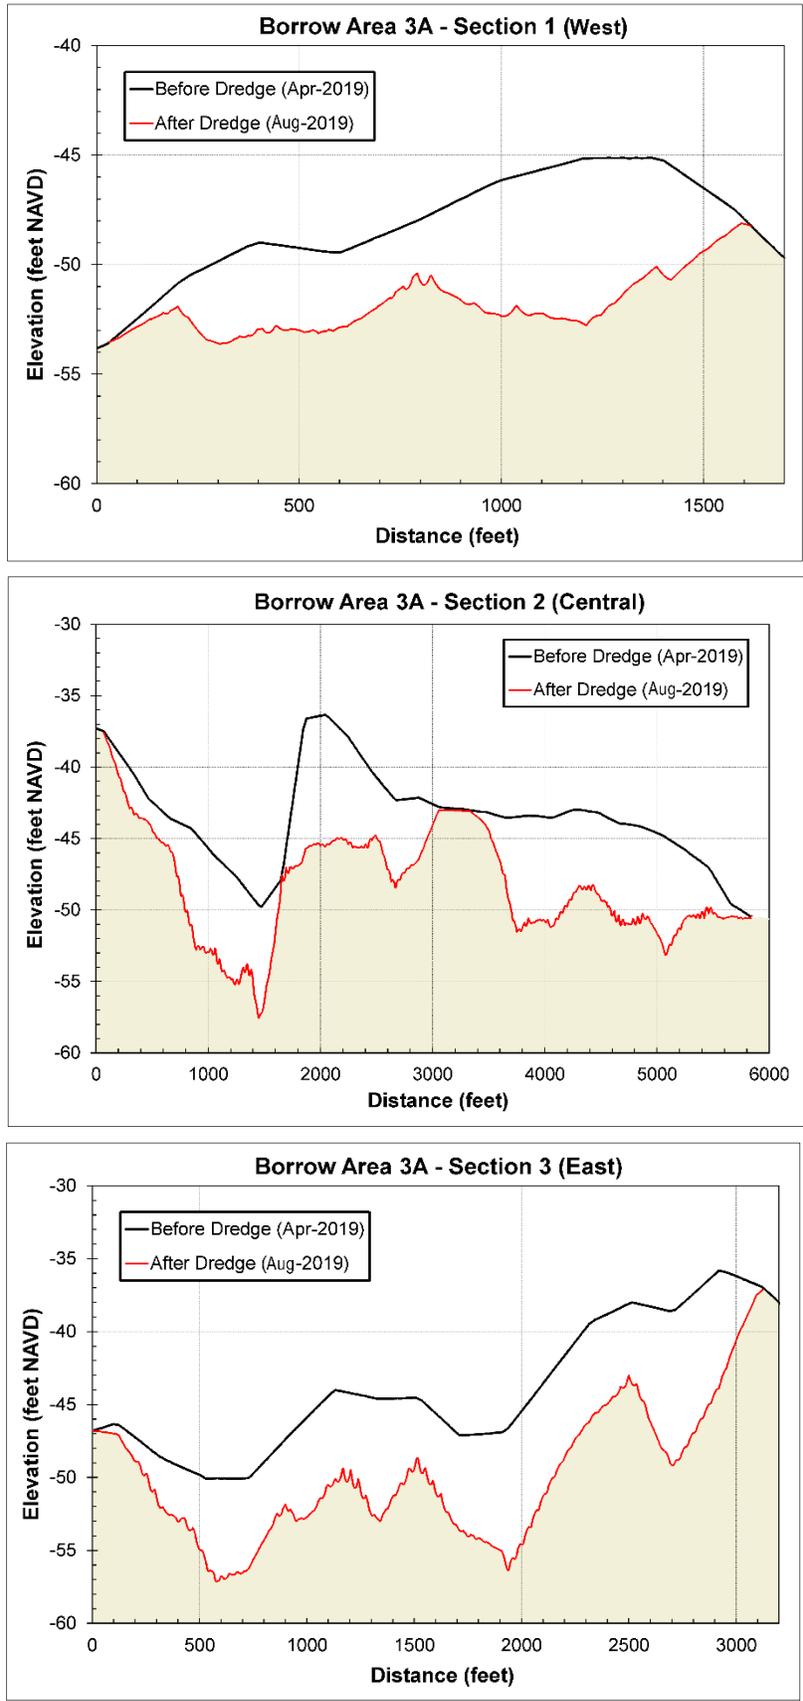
Representative cross-sections through Borrow Area 3A highlighting excavation during construction. Locations of these cross-sections are marked in Figure 7.1.
